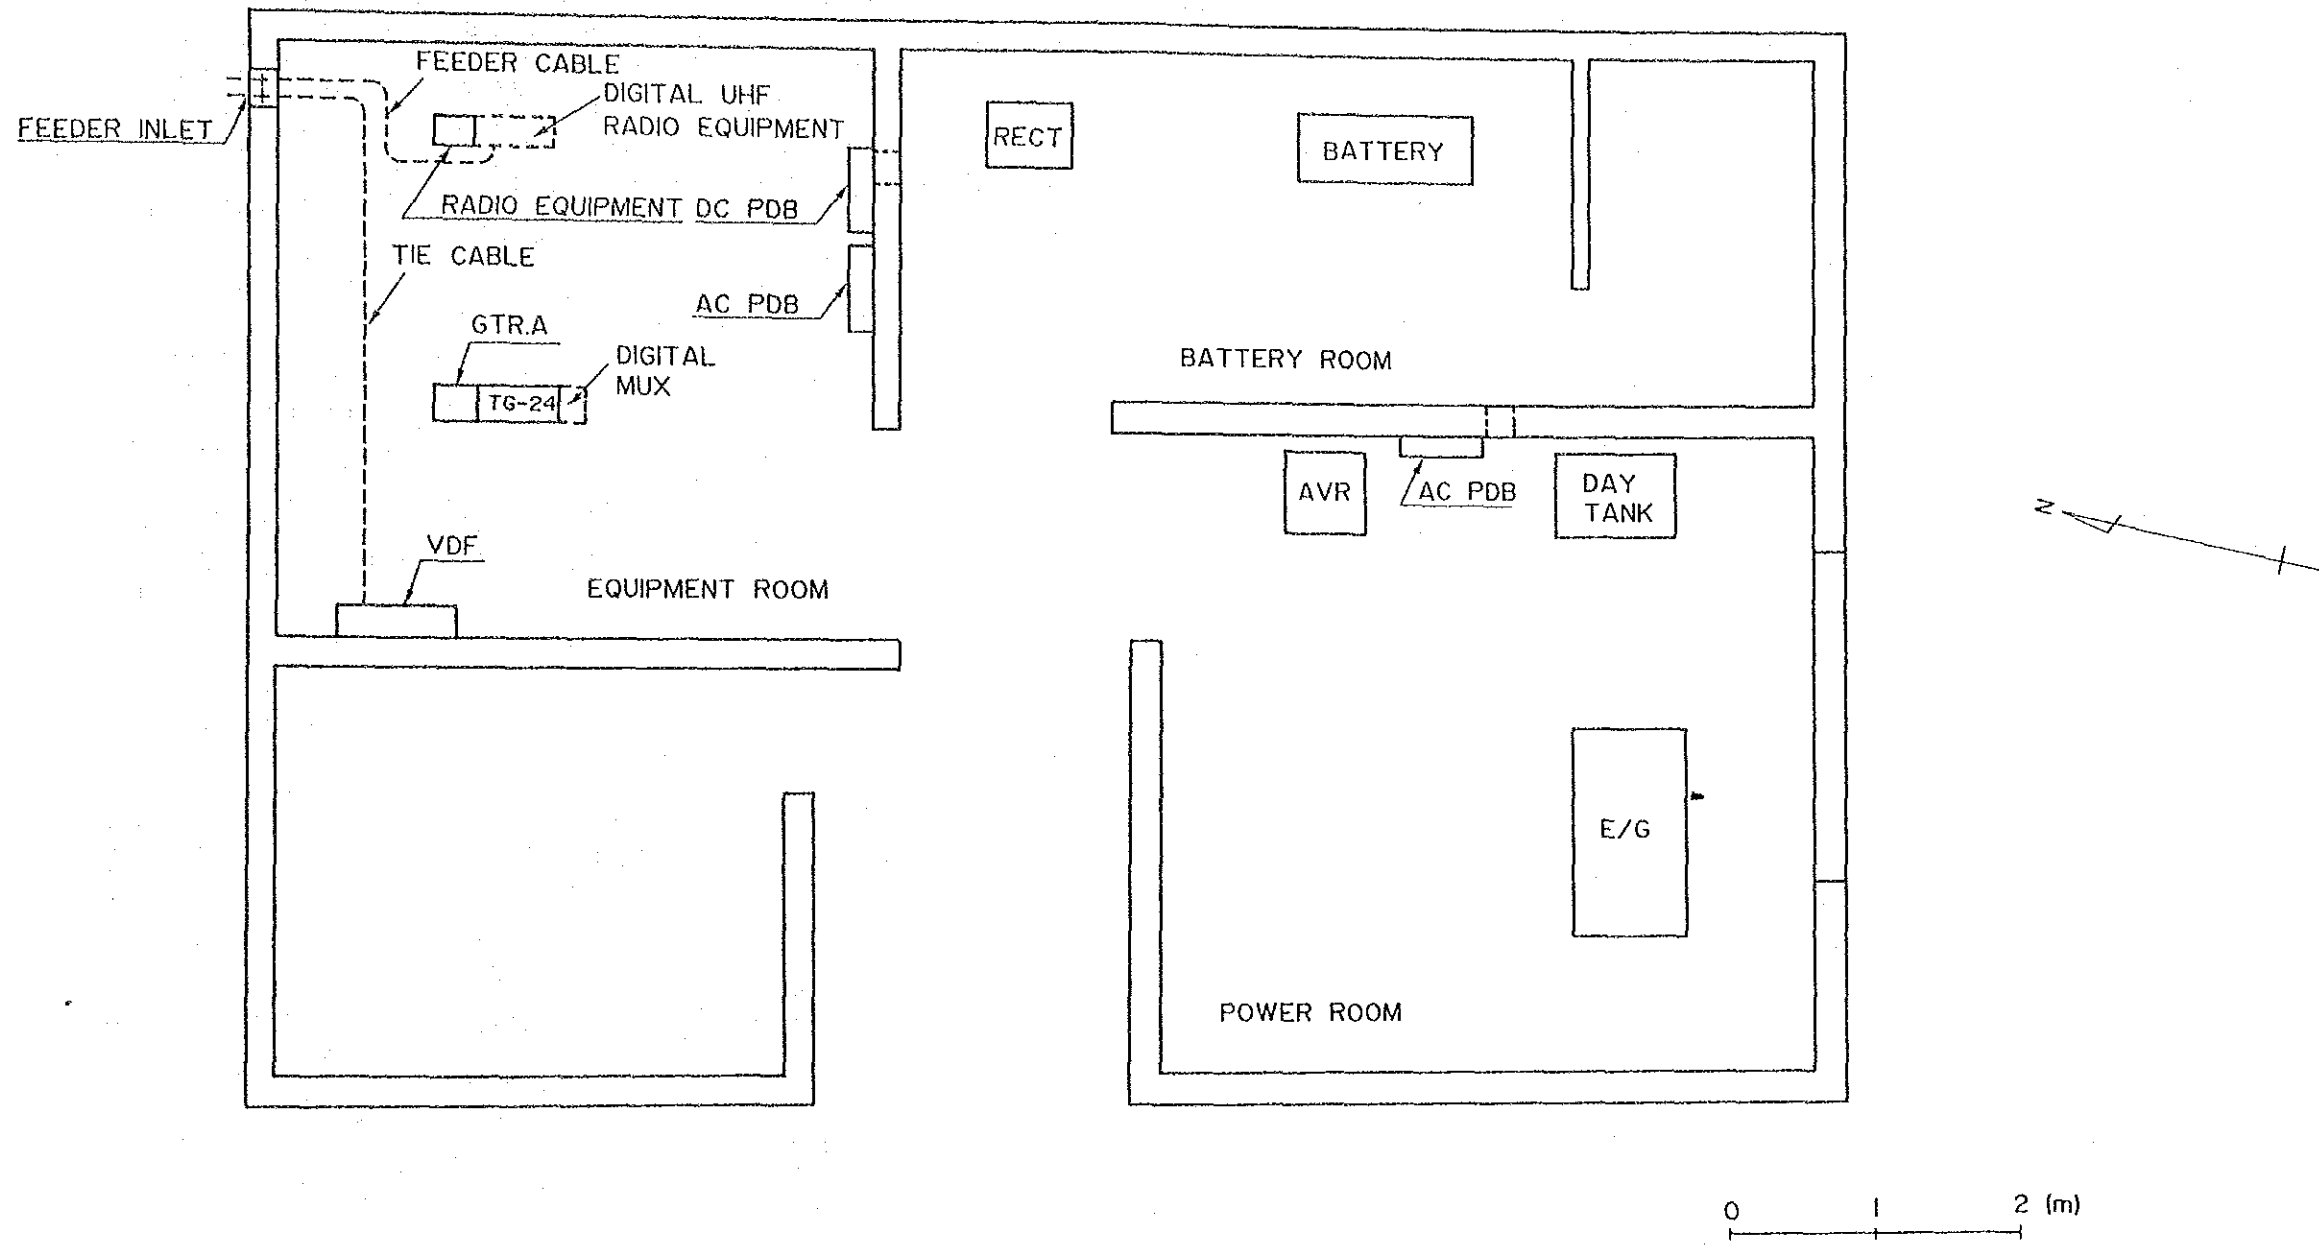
Floor Layout at Thayetmyo UHF Station
